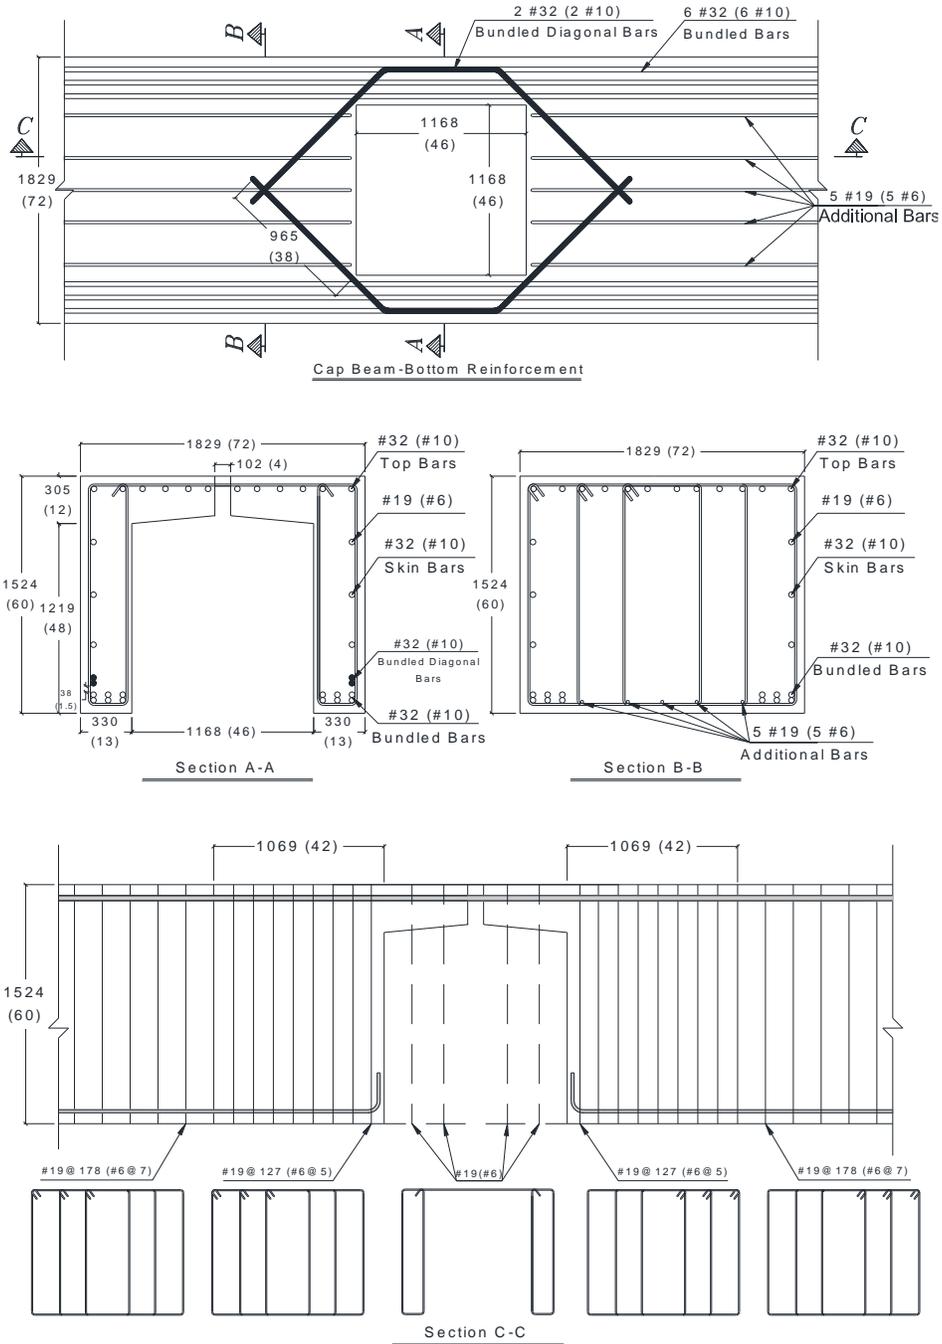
Design of square column-cap beam pocket connections [units are mm (in)]
